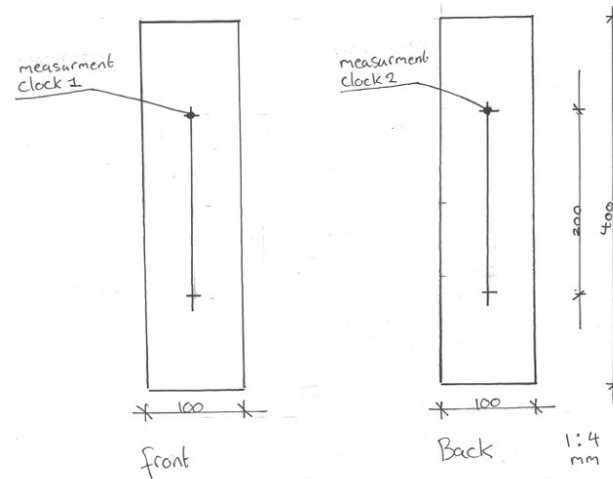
Dimensions of the shrinkage specimens and placement of the measurement clocks.
